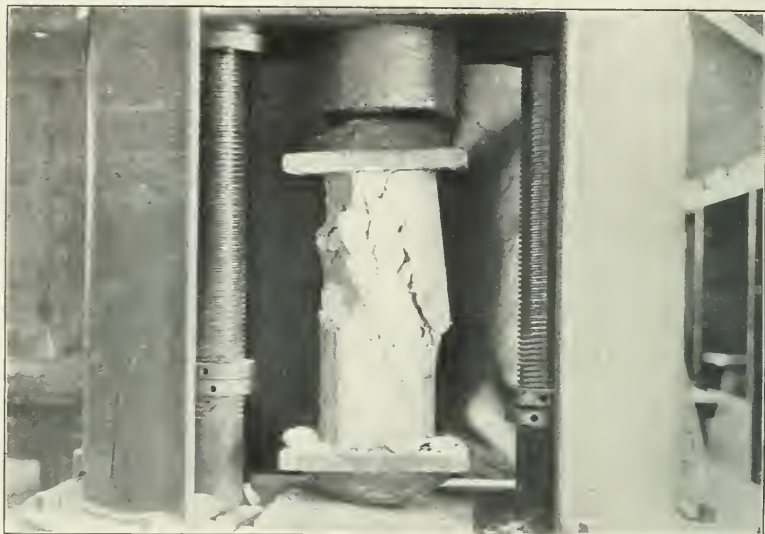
CONCRETE PRISM, JUST BEFORE COLLAPSE.
